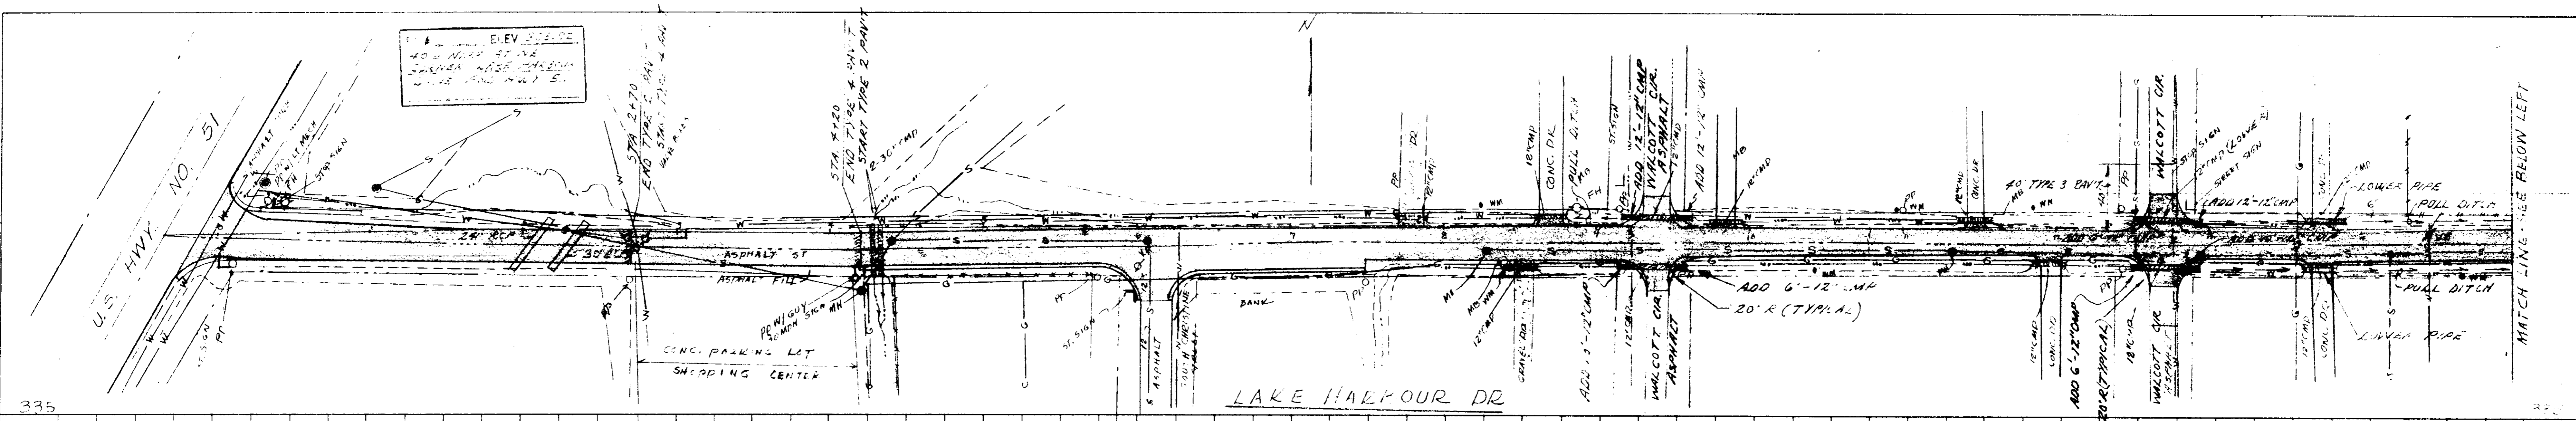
DOUBLE PLAN AND PROFILE-FULL LINE
